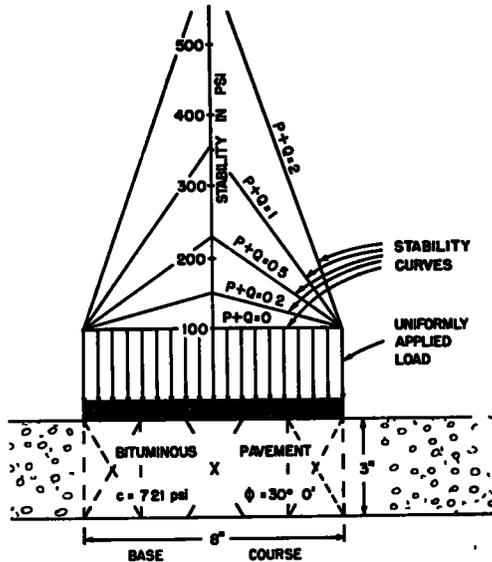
Relationships between Applied Load and Stability of Bituminous Pavements at Varying Distances from Edge under the Loaded Area and for Different Degrees of Frictional Resistance developed between Pavement and Tire and between Pavement and Base (Pavement Stability equal to Applied Load for Edge Conditions) Truck Tire
